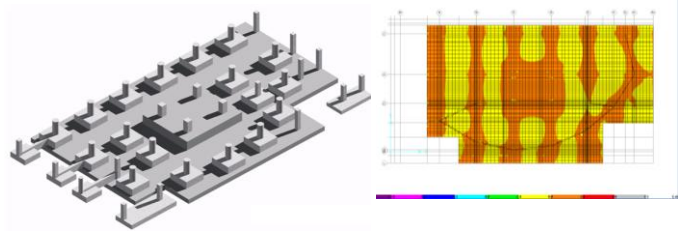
Construction of foundations. Top: slab with square caps in the structural core area and a main tower column. Bottom: schematic overview model of the main columns at foundation level.
